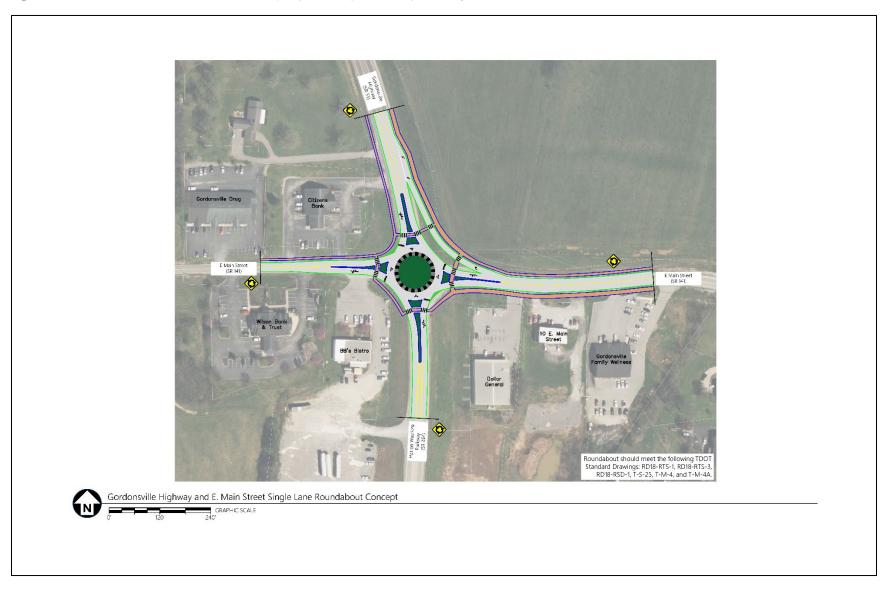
Roundabout Recommendation (Project ID 2) – Conceptual Layout
